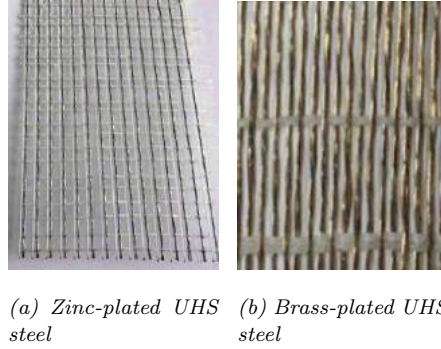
Example of some typical reinforcing steel textiles for TRM
